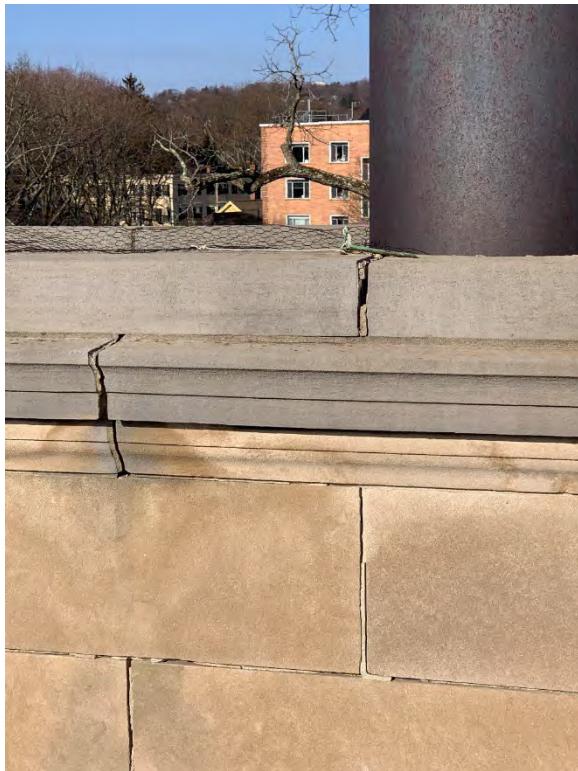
Detail of typical chimney masonry condition. Note all the open mortar joints.
